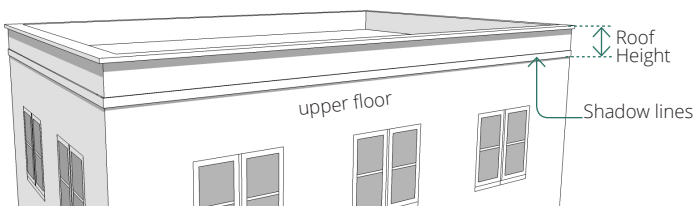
I-1. Example of a Parapet Cap Type
